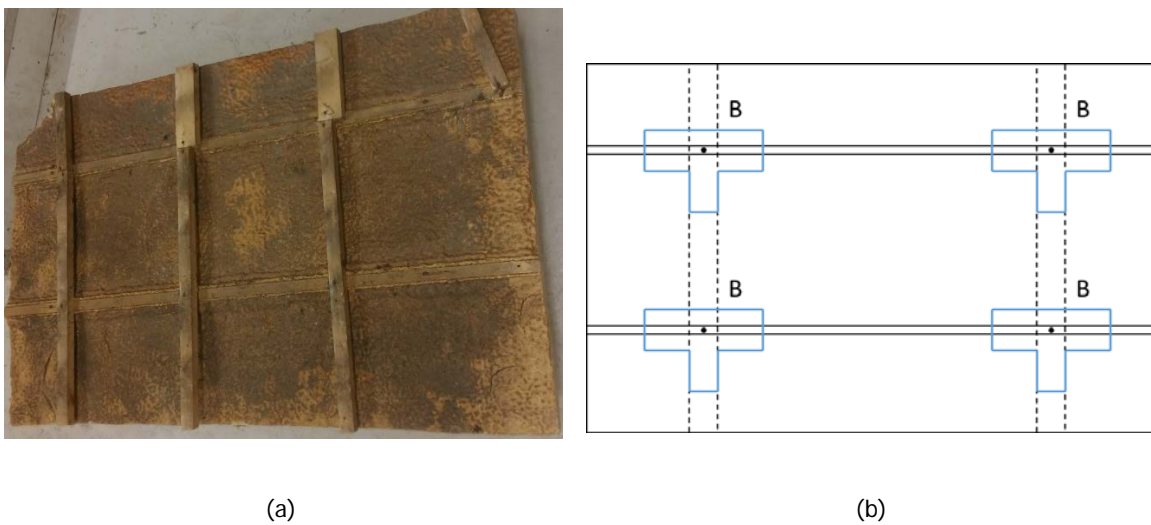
(a) Roof sample Z2, Zijlvest 25, Loppersum, (b) extracted test specimen (tile battens not shown).
